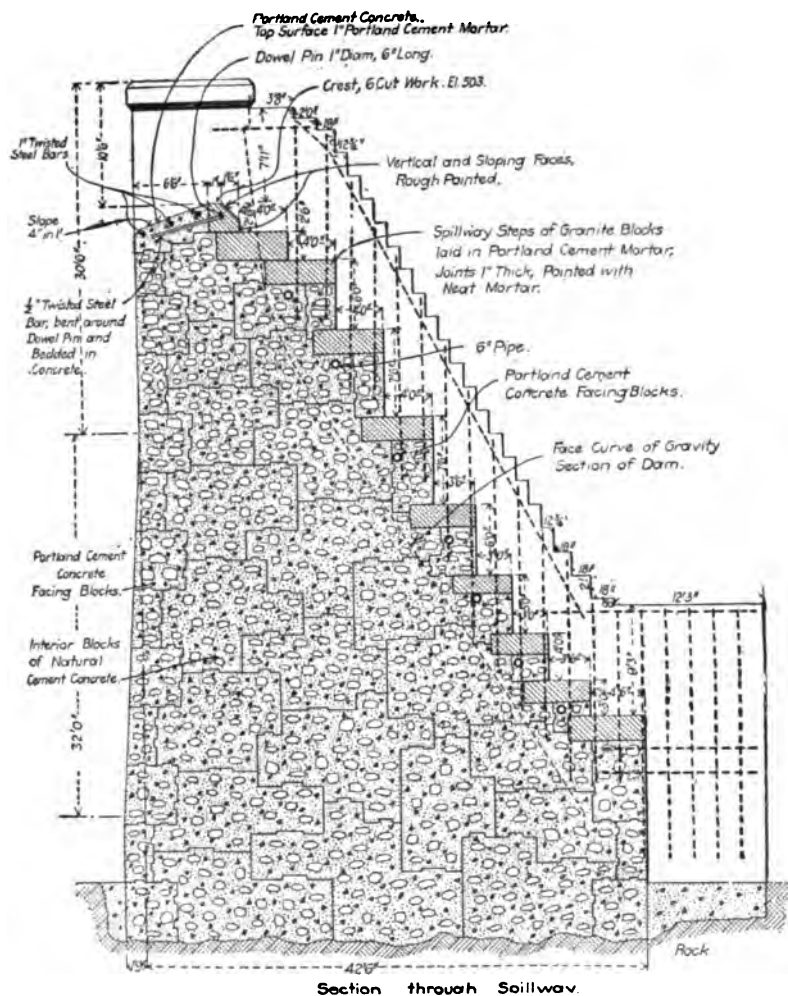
PEDLAR RIVER DAM, VIRGINIA, ILLUSTRATING CONCRETE BLOCK CONSTRUCTION.
